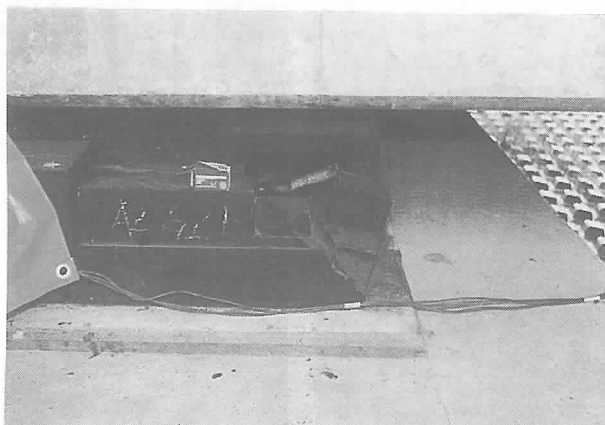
Broken shoe (PC box girder bridge, constructed in 1991, Urahoro)
